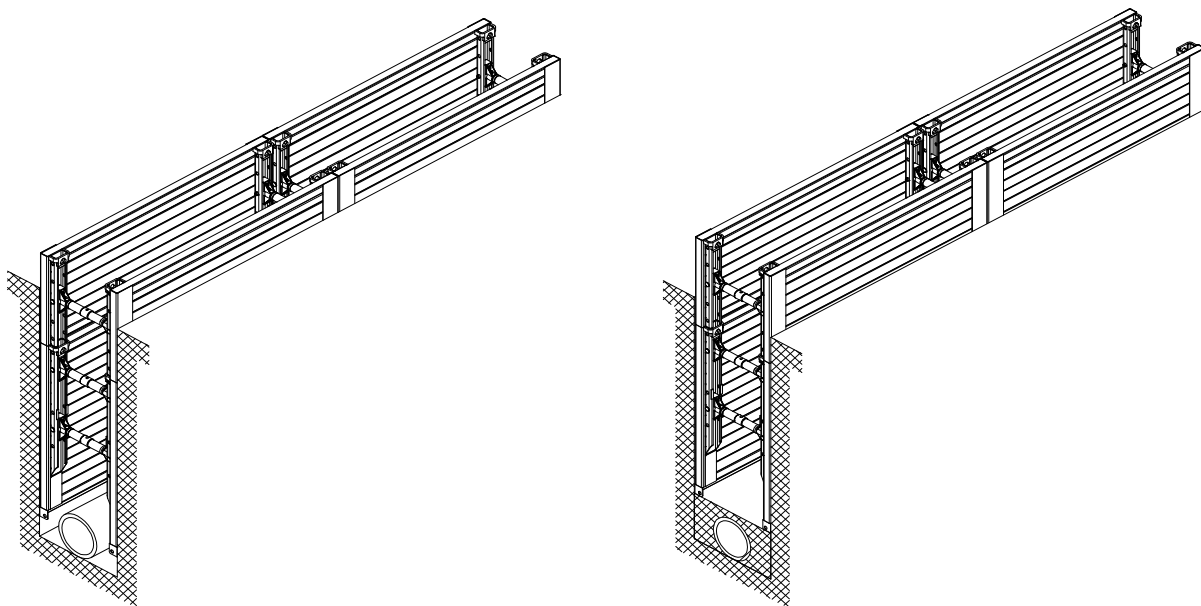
Extracting the shoring with backfilling and compacting of the trench
